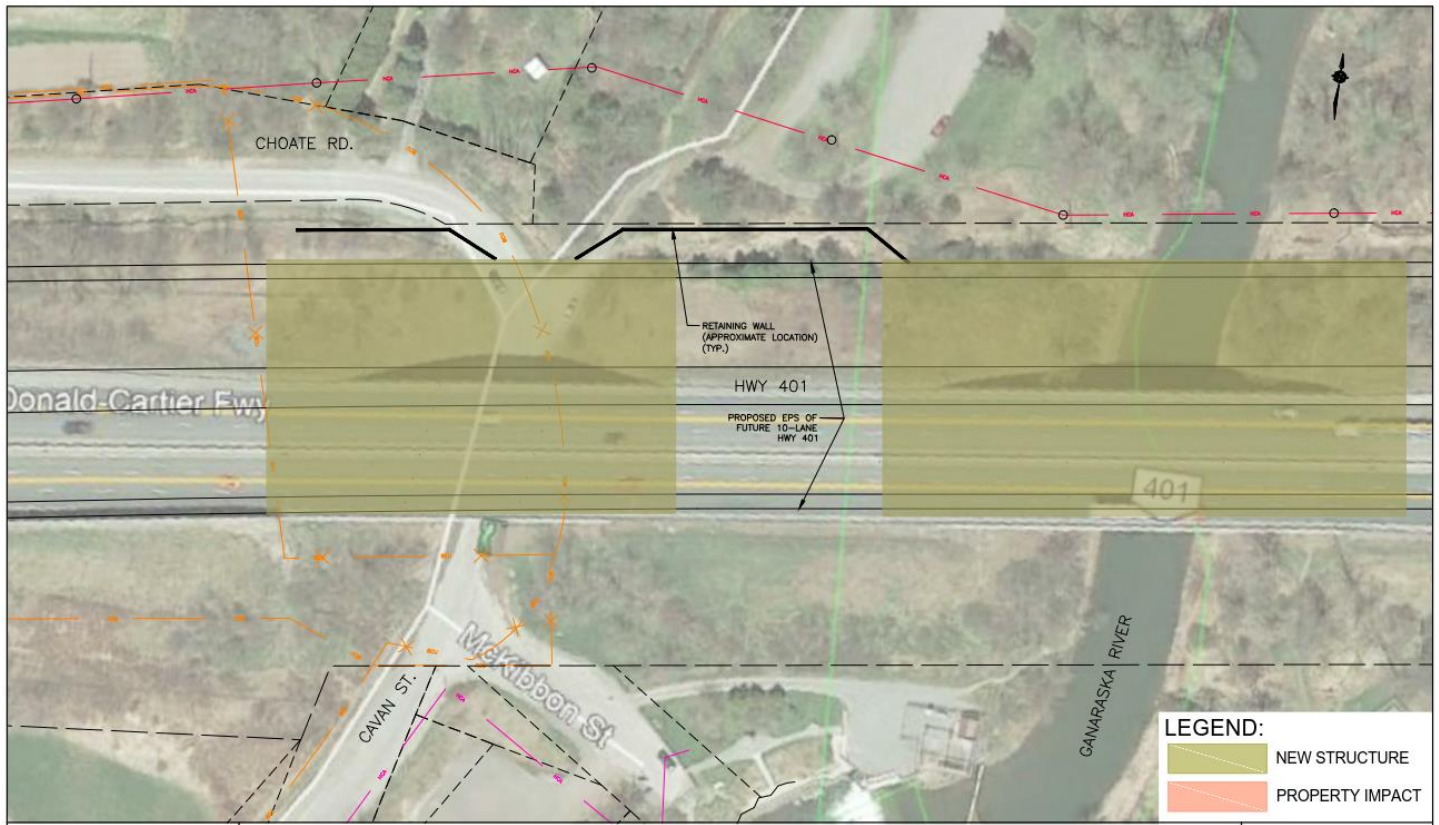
Choate Road and Ganaraska River bridges Alternative 1
